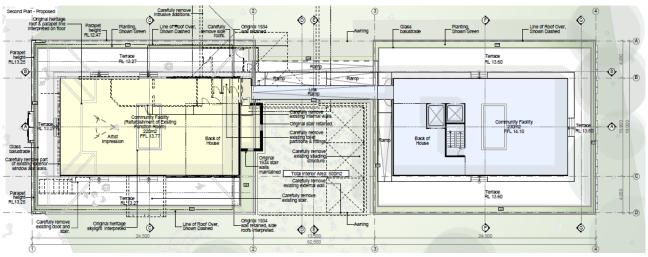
Proposed second-floor plan. Source: Lockhart-Krause Architects, 2021
